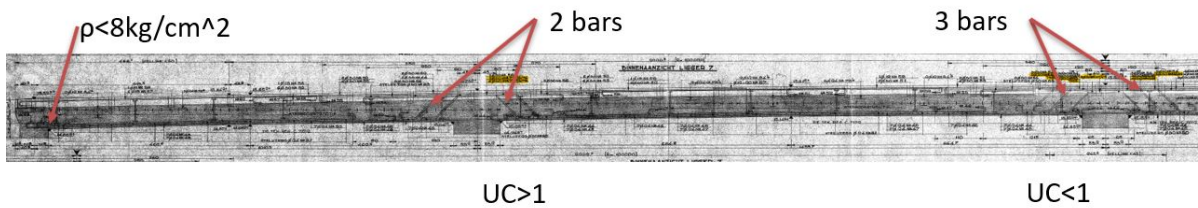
Longitudinal cross-section of a RC bridge deck to overview the reinforcement, and unity checks for shear force, leading to no need for additional shear capacity from reinforcement for the end-supports.
